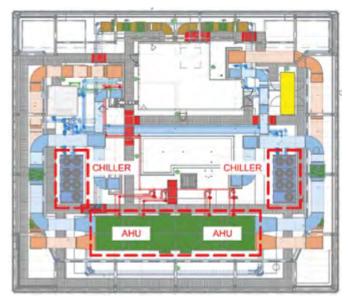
AIR HANDLING UNITS AND CHILLERS AT ROOF LEVEL
